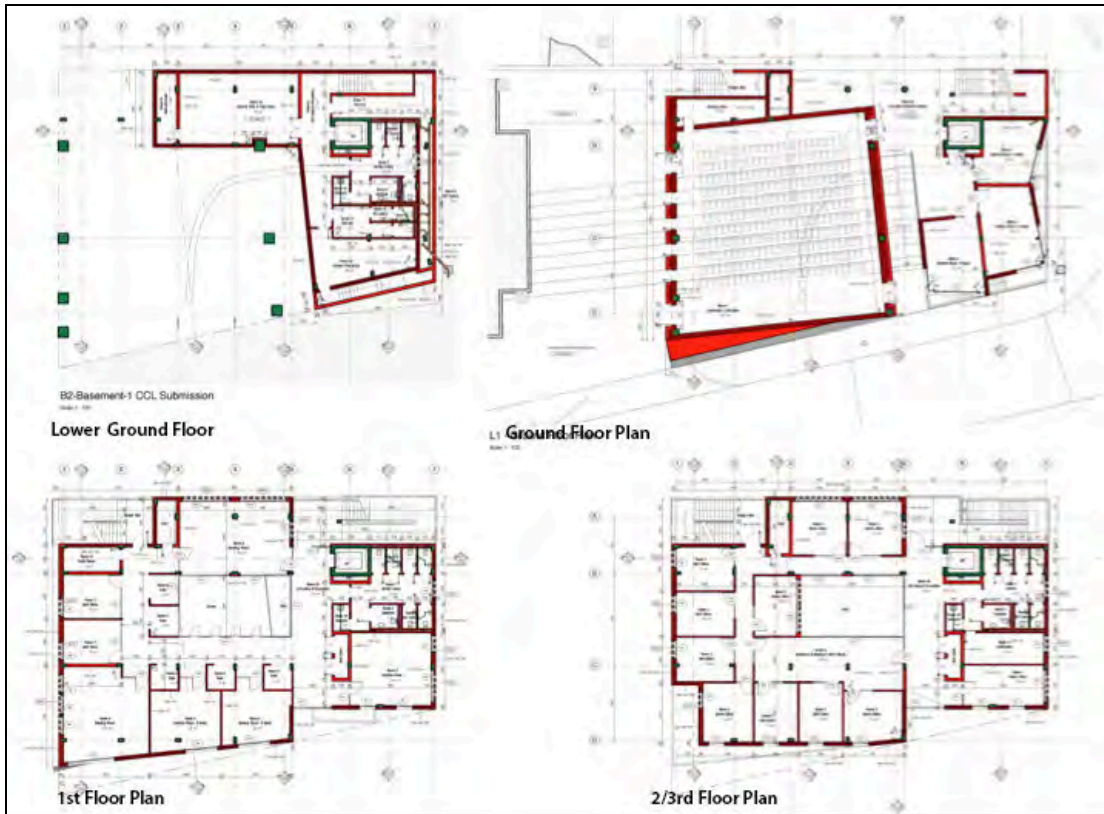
University of Mpumalanga Campus Building L04 – Administration Building Plans
